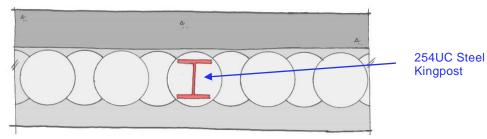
Indicative view of 254 UC Kingpost installed within piled wall
